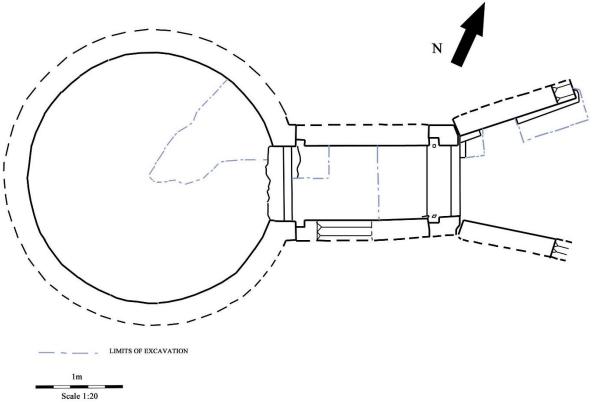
The general plan of the ice house with investigated areas outlined in grey
